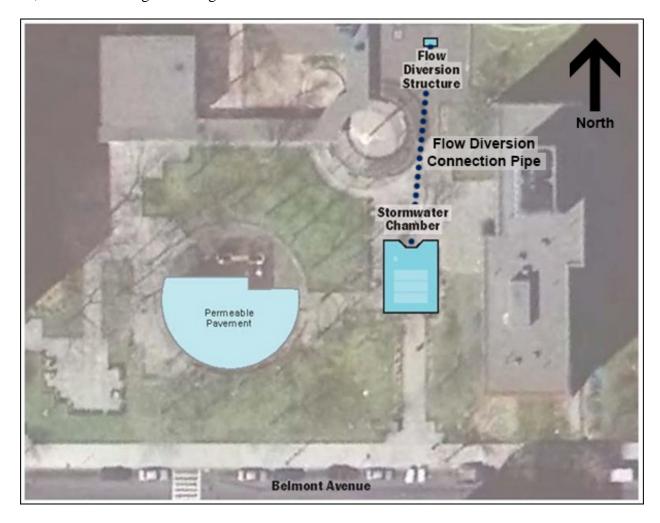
Location of On-site GI Controls in Demo Area 2
